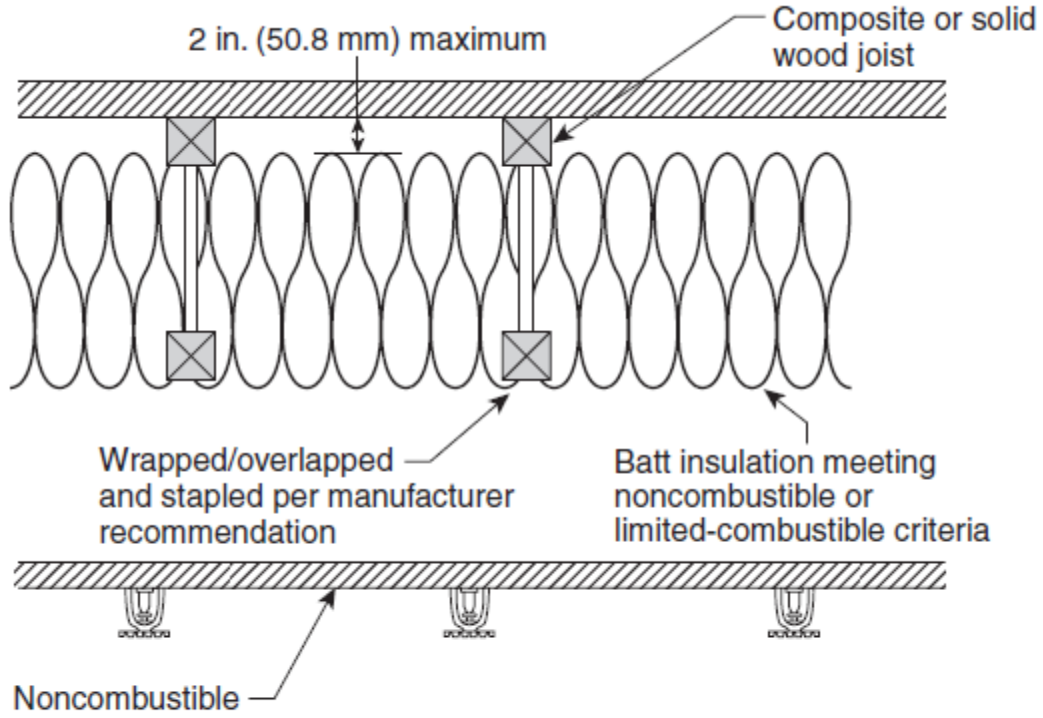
Acceptable Arrangement of Concealed Space Not Requiring Sprinklers.
